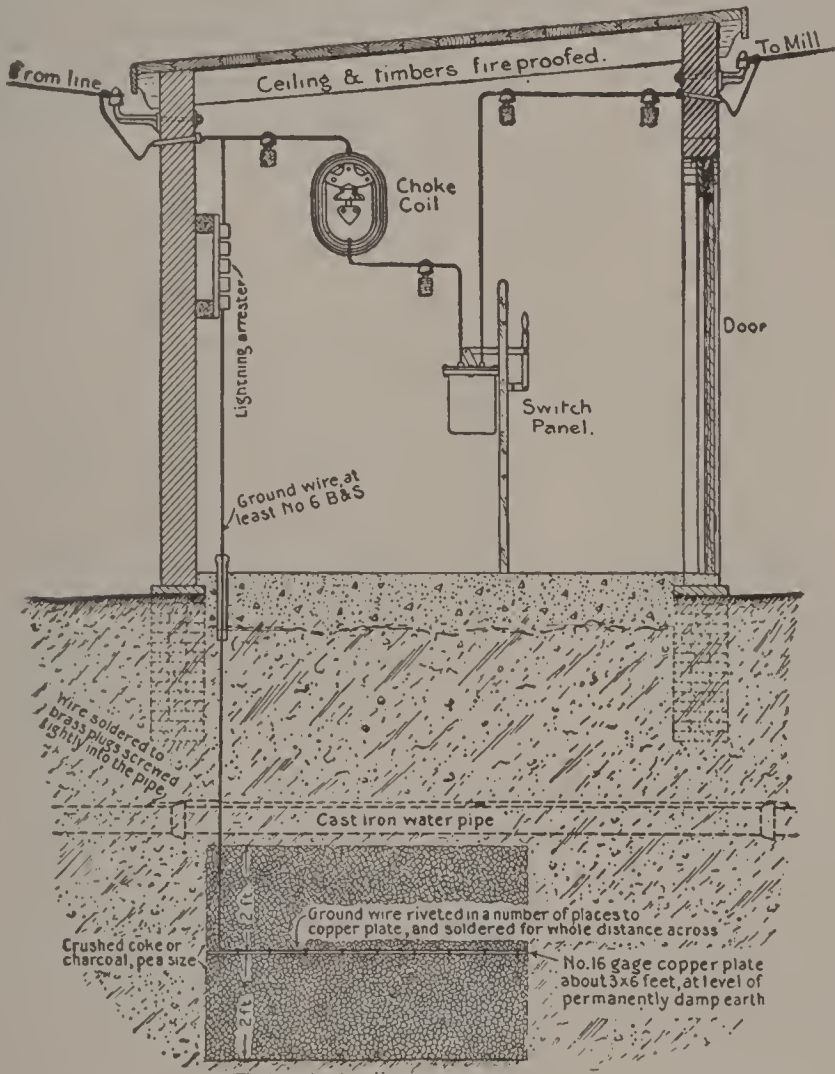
LIGHTNING ARRESTER HOUSE, WITH GROUND CONNECTION.
